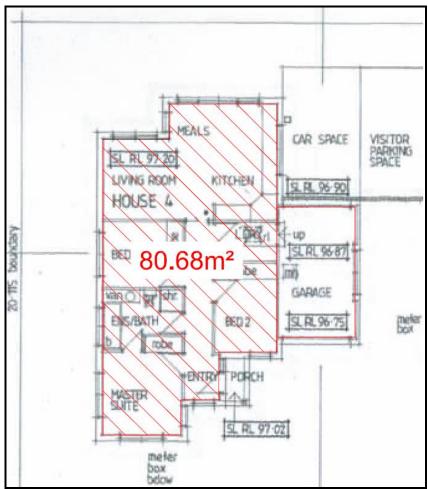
Extract of the proposed floor plan for Dwelling 4. Highlighted in red is the area of the dwelling which constitutes 'gross floor area' as per the definition contained within the Standard Instrument. The notable omission is the area of the proposed single car garage which is to be excluded from the gross floor area calculation as per the definition. The resultant gross floor area as calculated on CAD for the Dwelling 4 is 80.68m².
